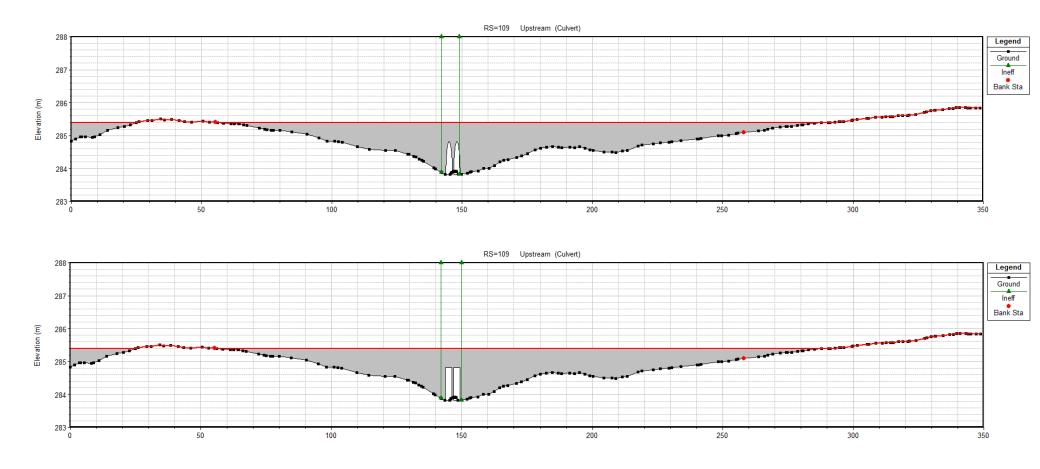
Cross-section along Proposed Culvert, for Box and CSP culverts
